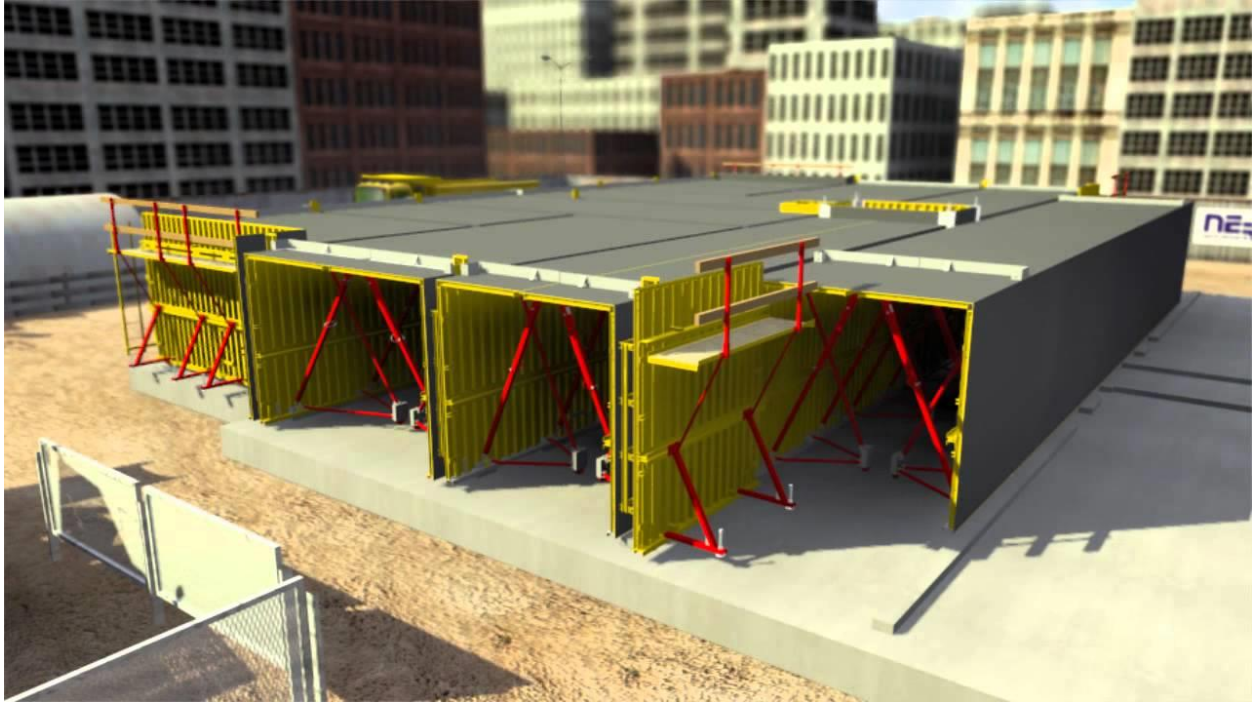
3 Installation system of Tunnel Formwork system (Kim, 2013)
